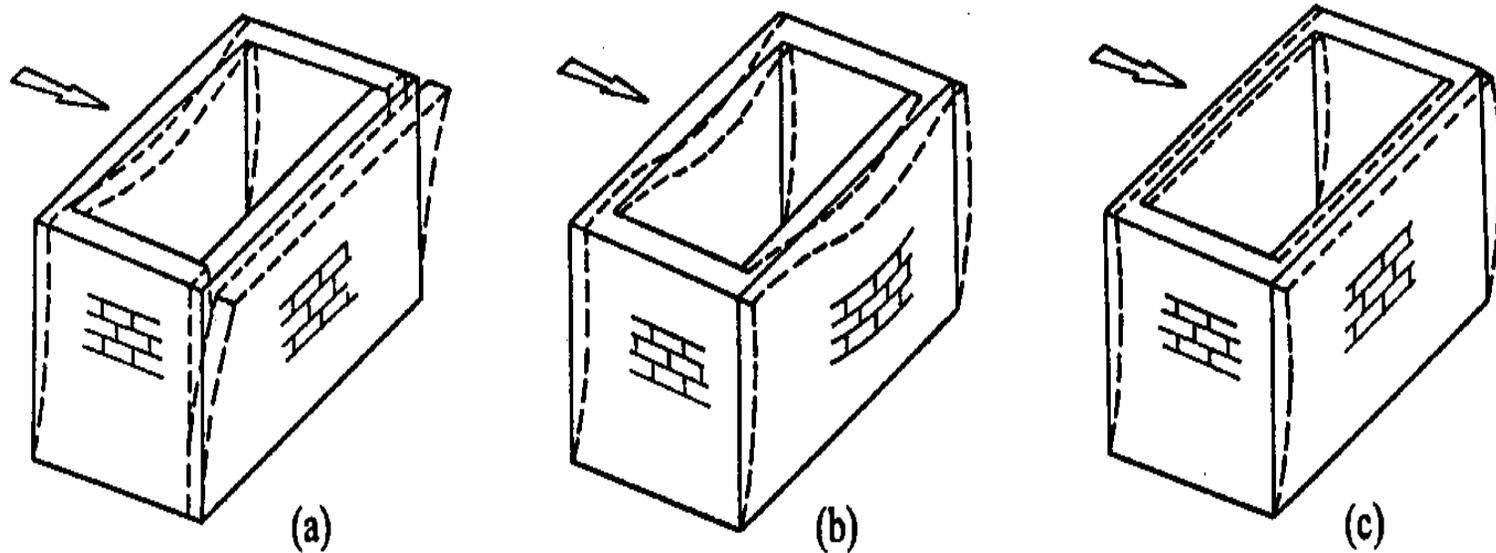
Vibration of masonry buildings during earthquake. (a) Building with wooden floors without ties, (b) building with wooden floors and tied walls, and (c) building with rigid floors and tie-beams
